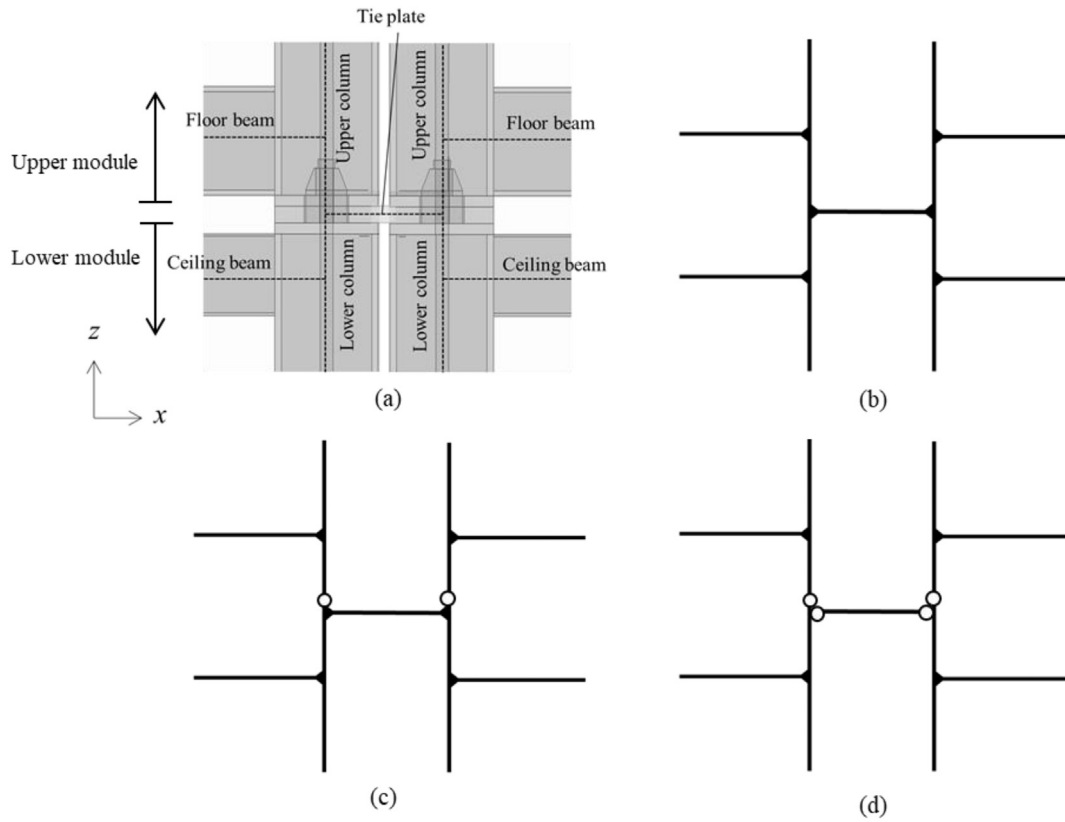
Inter-module connection (a) schematic view, with its simplified joint models showing (b) fix-ended vertical and horizontal connections, (c) pin-ended vertical connection and fix-ended horizontal connection, and (d) pin-ended vertical connection while having pin-ended horizontal connection (releasing the out-of-plane rotational restraint and fixing in-plane rotational restraint).
